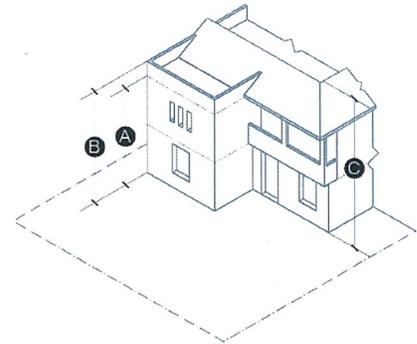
Plate height 'A', maximum height of flat roofs 'B', and the maximum height of pitched roofs without a linear horizontal ridge line formed by the juncture of two sloping roof structures 'C' are each addressed by the recommendations language.
